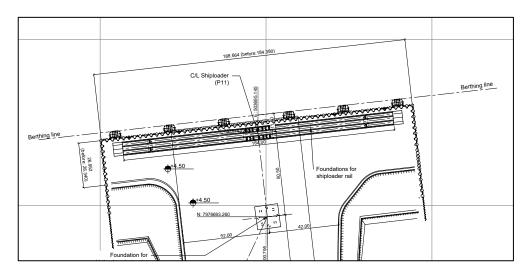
Drawing – plan view (current design total dock width is 188.7m (end piles CL to CL)
